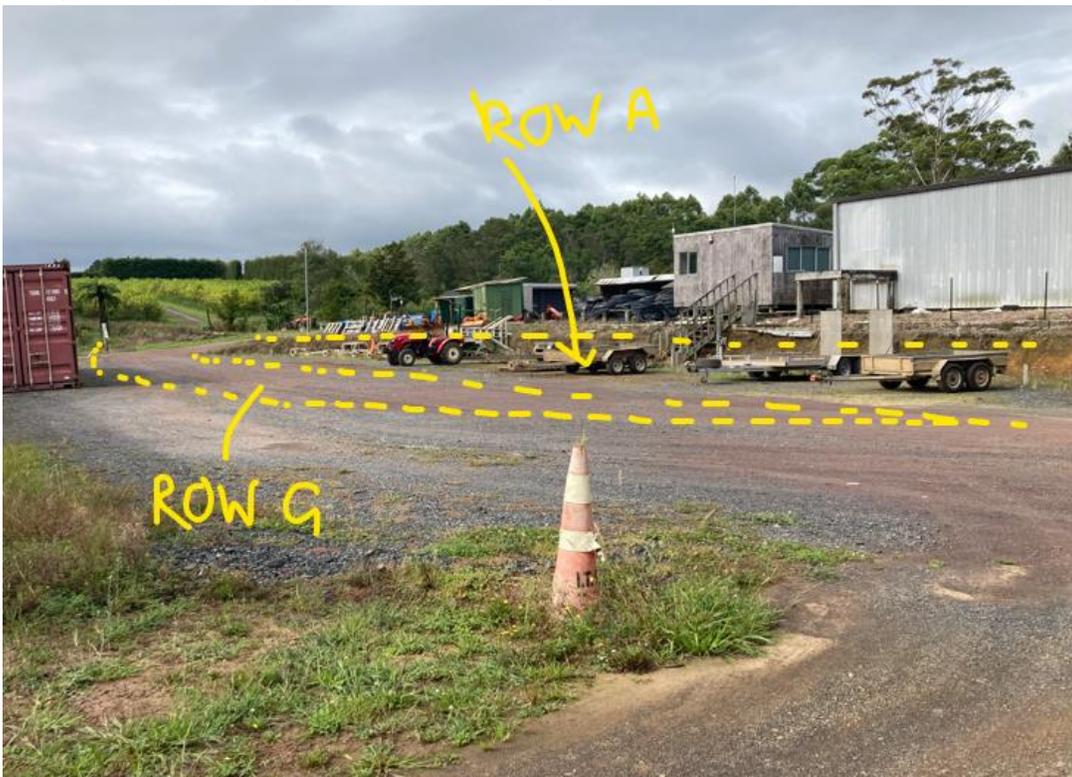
Existing accessway covered by RoW A / G, looking south-west
